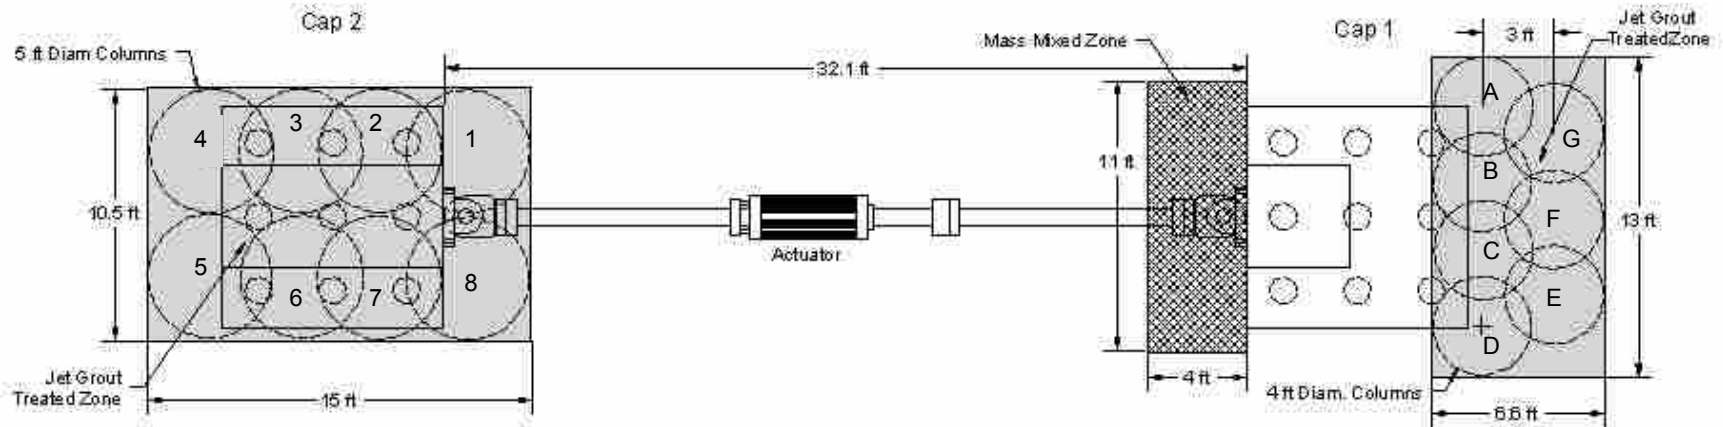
Detailed plan view of pile cap 1 (right) and pile cap 2 (left) after mass mixing and jet grouting soil improvement.
